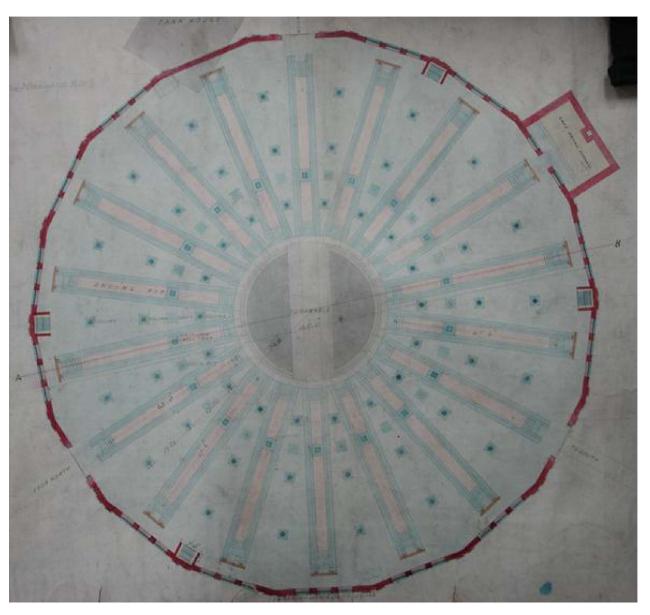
Plan of RH3, as designed (NA RAIL 527.2369)
